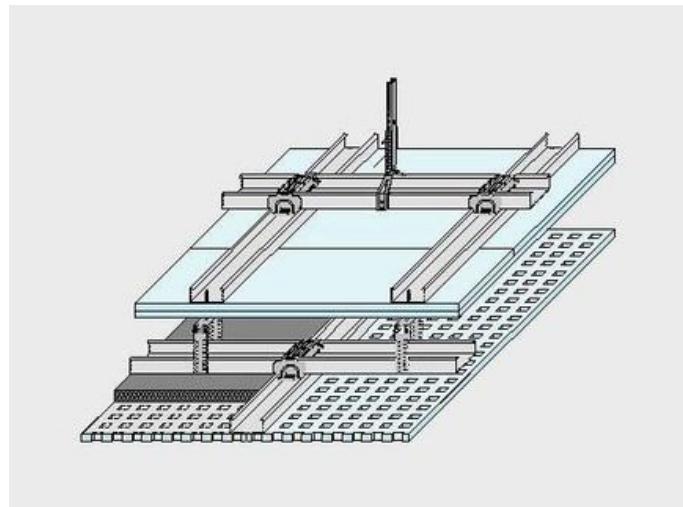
Structure of the false ceiling provided by KNAUF.
